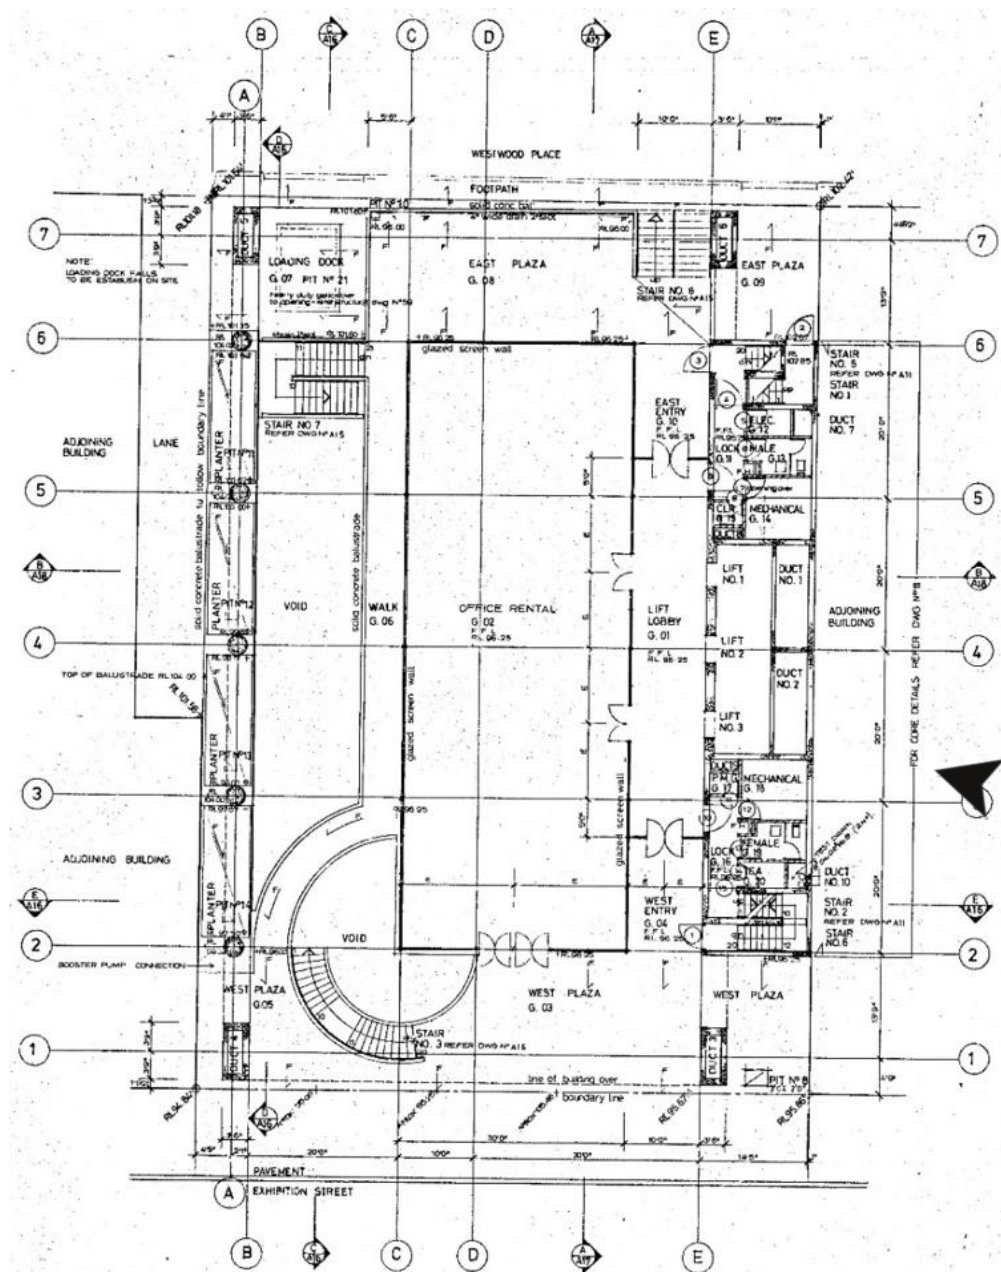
Detailed ground floor plan, dated 1975 (BAP).
